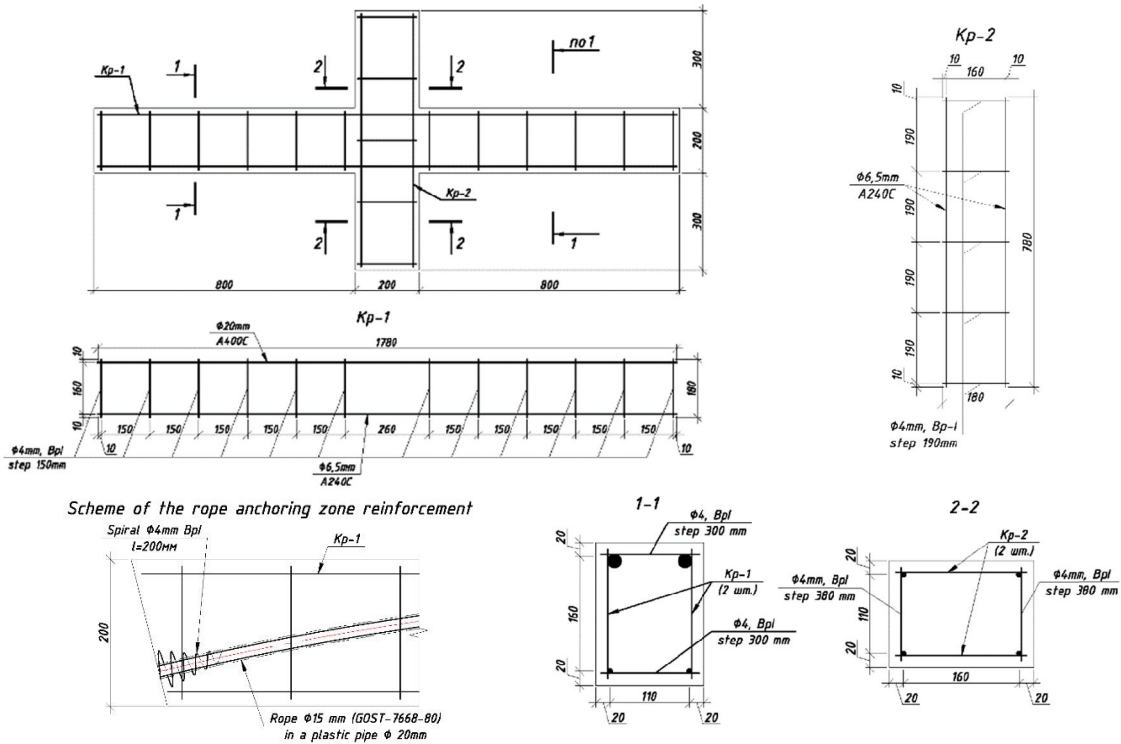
The scheme of samples reinforcement with non-tensioned and transverse reinforcement steel.
